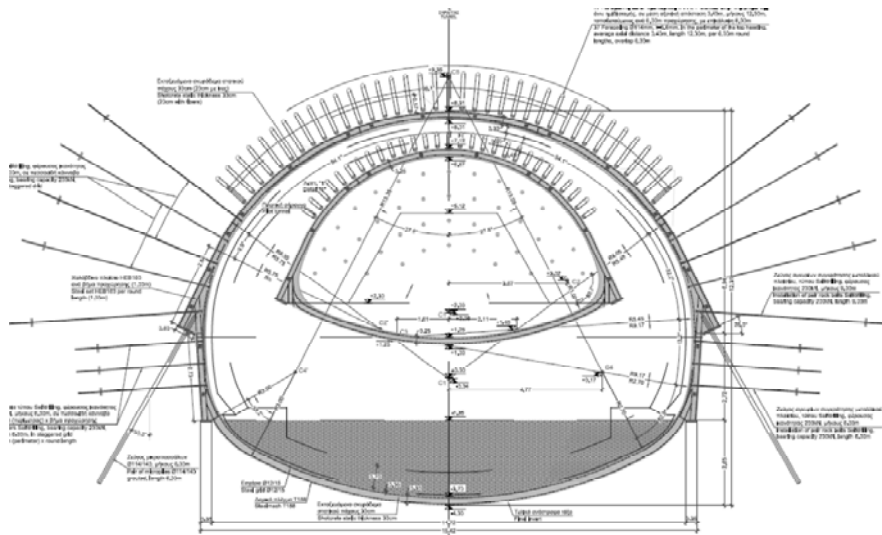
Layout Configuration and geometry of the “short pilot tunnel”.
